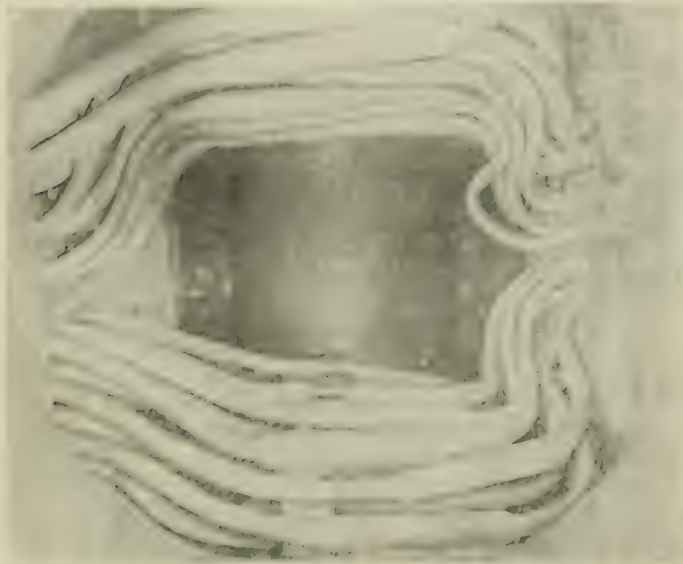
REINFORCED CONCRETE MANHOLE.
